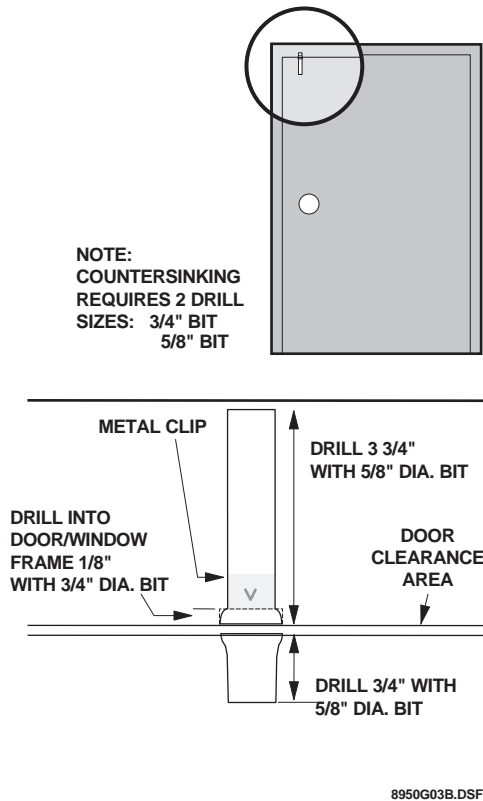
Preferred Method: Countersunk Mounting Dimensions
